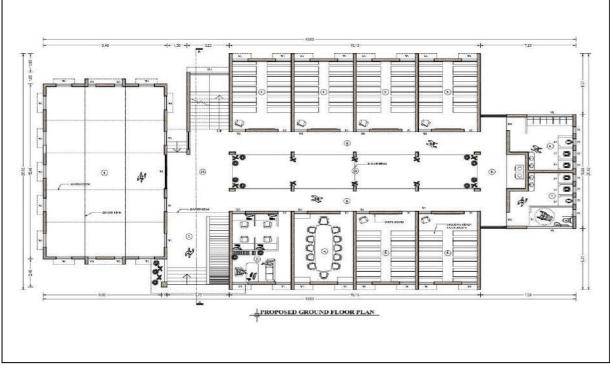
Ground Floor Plan of Primary & Secondary School
